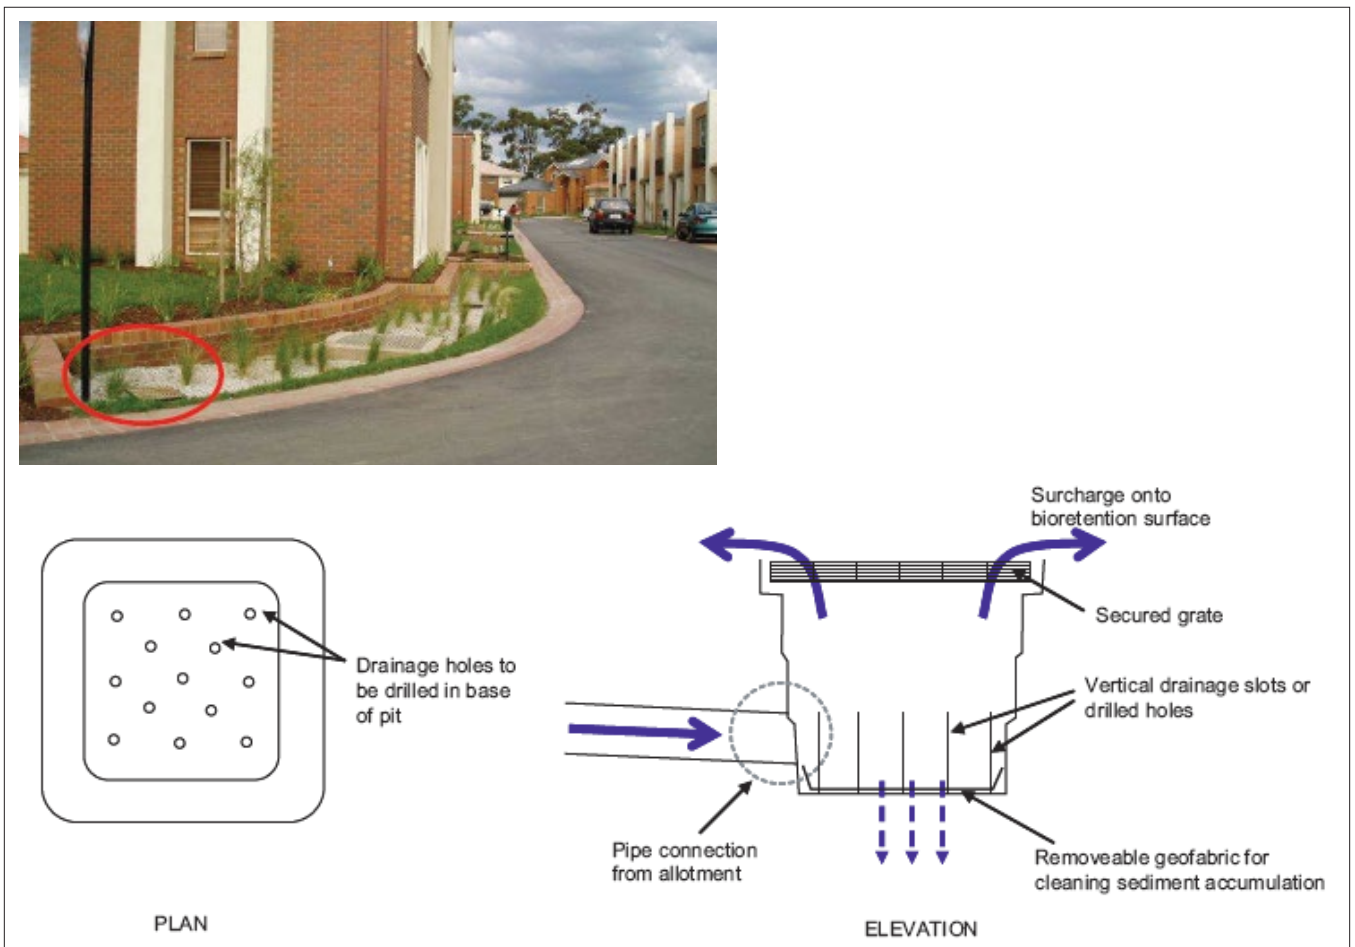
Surcharge inlet pit containing drainage holes at base of pit and removable geotextile layer for cleaning accumulated sediment (source: (Melbourne Water, 2005)).
